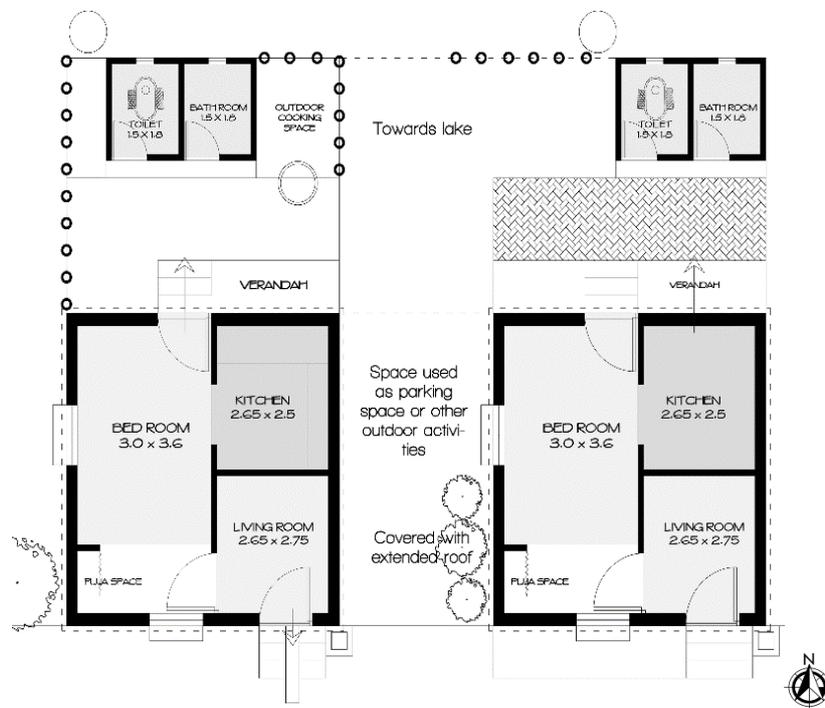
Existing typical floor plans of fishermen houses provided by the Odisha government, 2019. Source: (Author).
